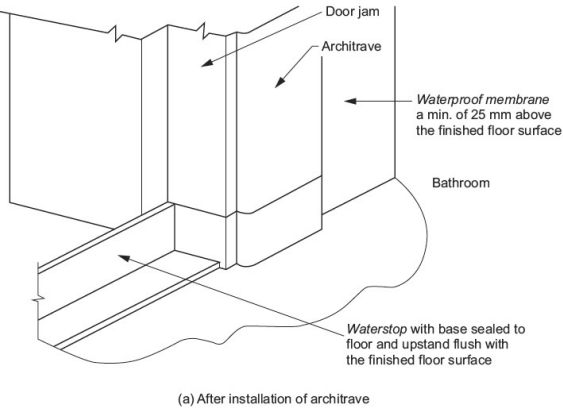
Typical bathroom door details for whole bathroom waterproofing
